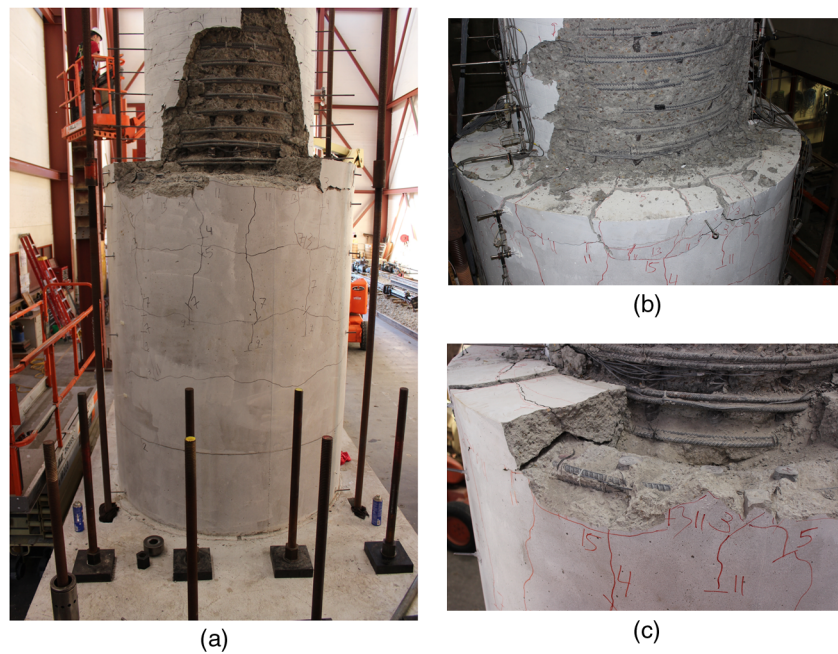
Damage in Specimen 2: (a) column base and pile; (b) cracks atop of the pile; (c) fracture surface atop of the pile
